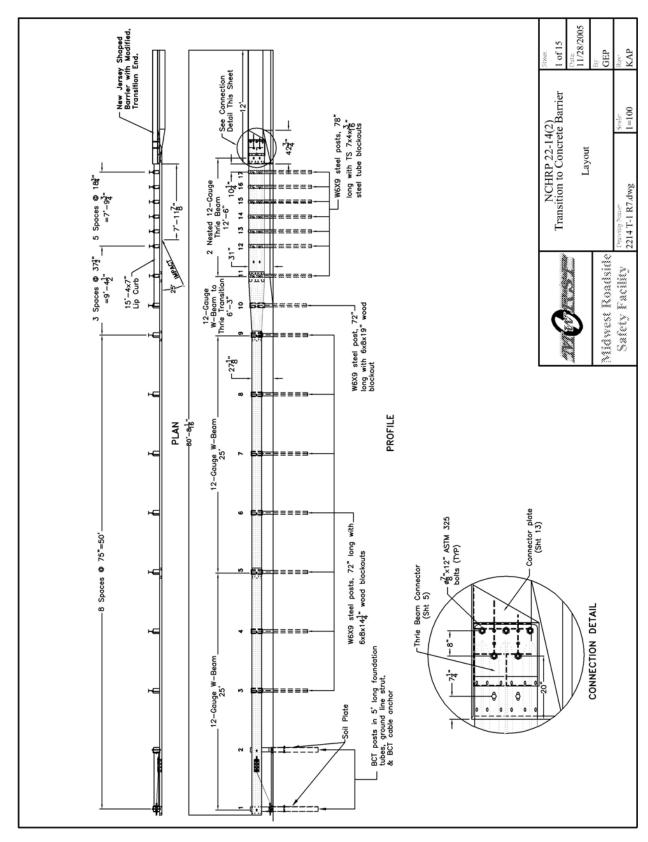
Layout of Approach Guardrail Transition to Concrete Barrier (English)
